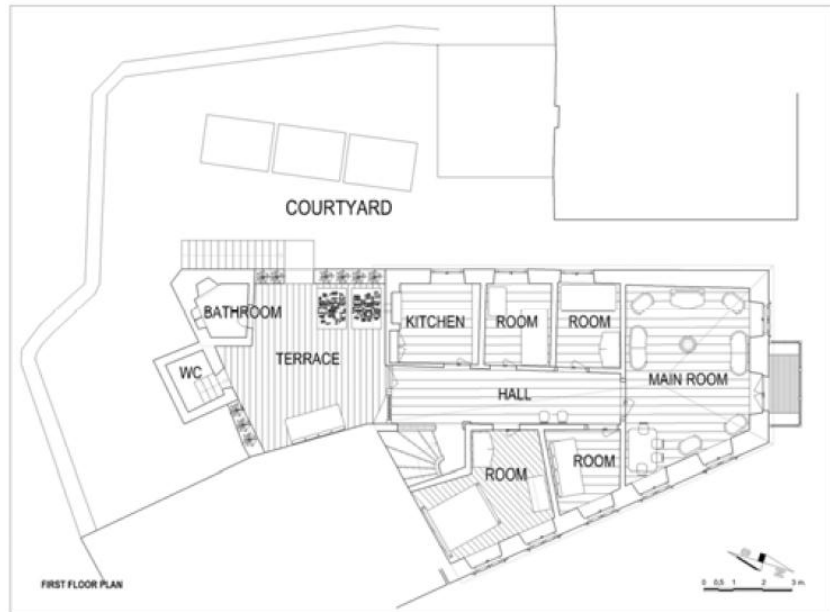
A Vernacular House Plan Hamamcıoğlu M. and Saygı G. 2008. A
